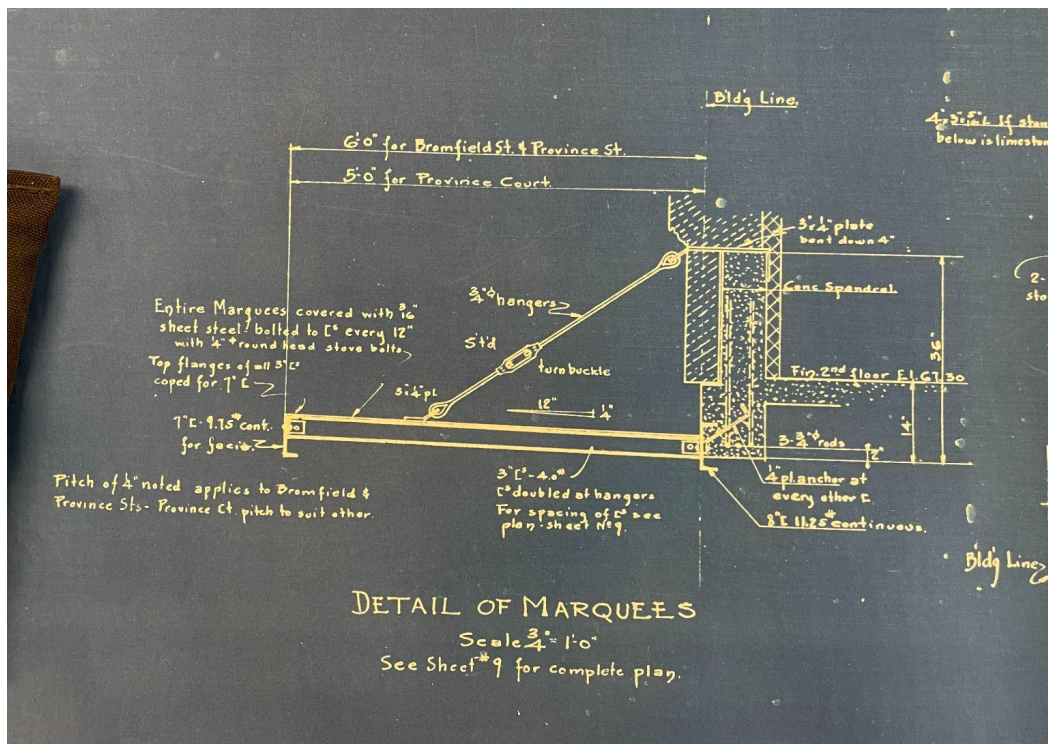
Original building plans showing a detail of the marquees on the street-facing façade and side elevations.
